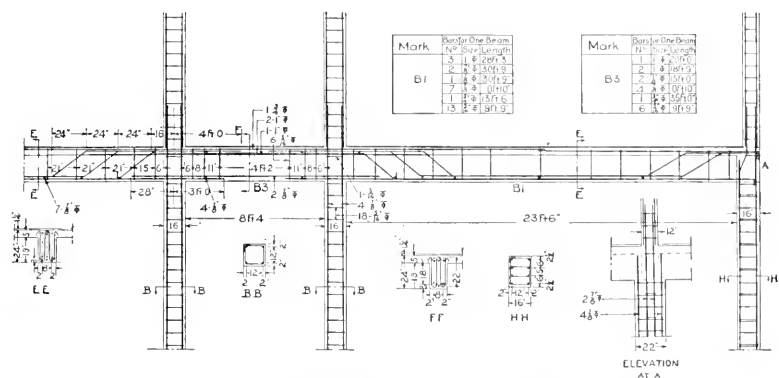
TYPICAL BEAM AND COLUMN ON MINOR COURT.
